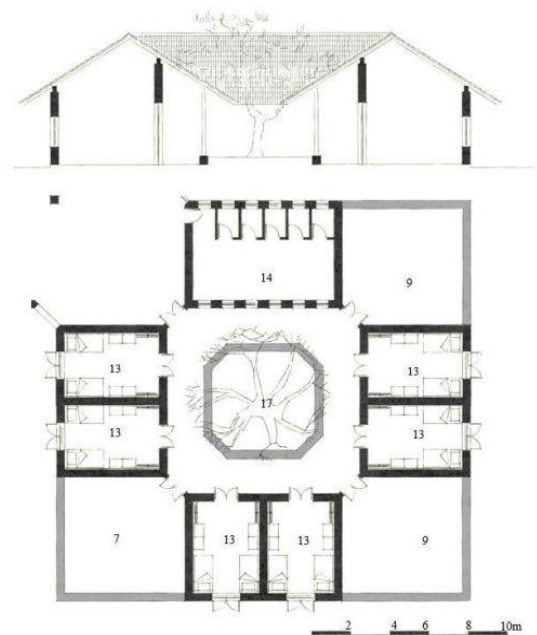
Section & Plan of children's Accommodation Area - SOS Youth Facility for Boys – Piliyandala [Drawing] (Source – By Author)
